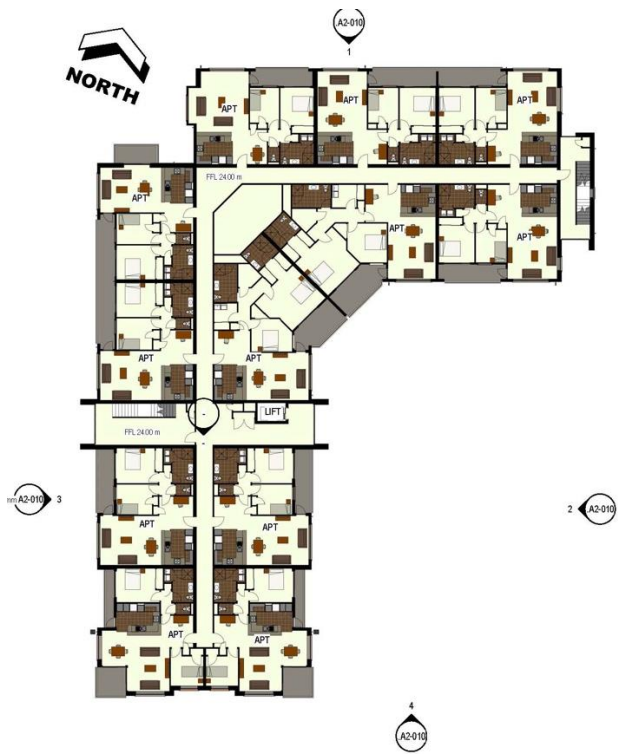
The Level 3 floor plan of Building B02 (Ryman Drawing A1-020 RC18).
